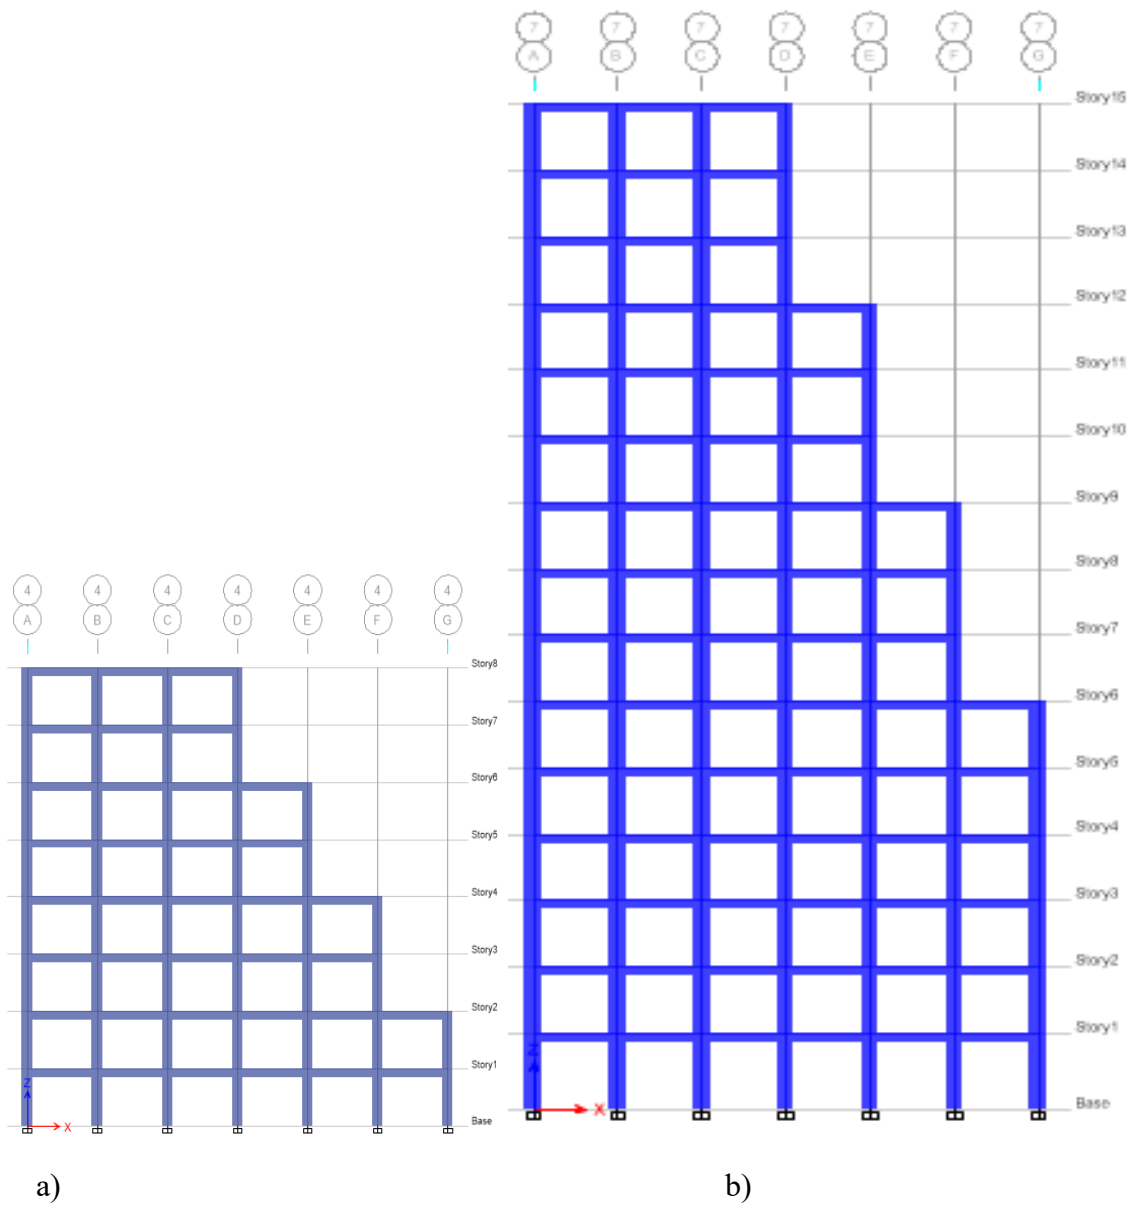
2D view of Setback irregular structural model; a) story 8 and b) story 15
